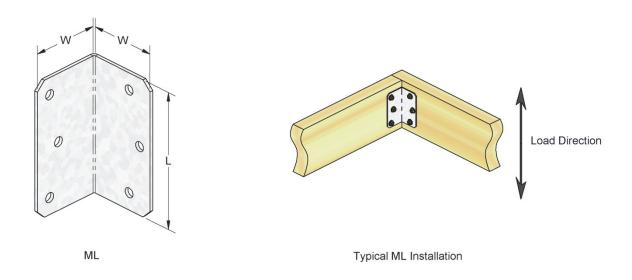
ML ANGLE CONNECTOR AND TYPICAL INSTALLATION DETAIL
